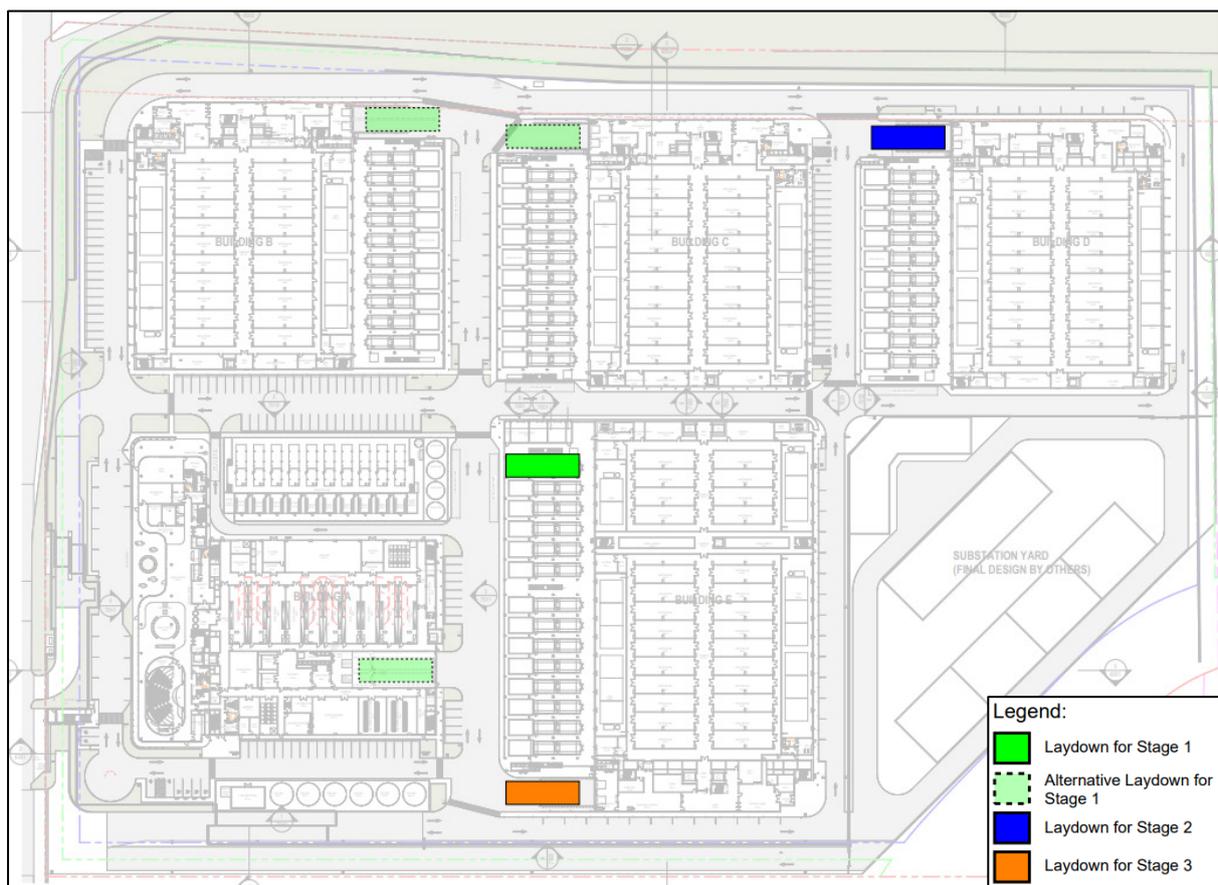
Site plan showing waste storage and collection areas for the construction stages
